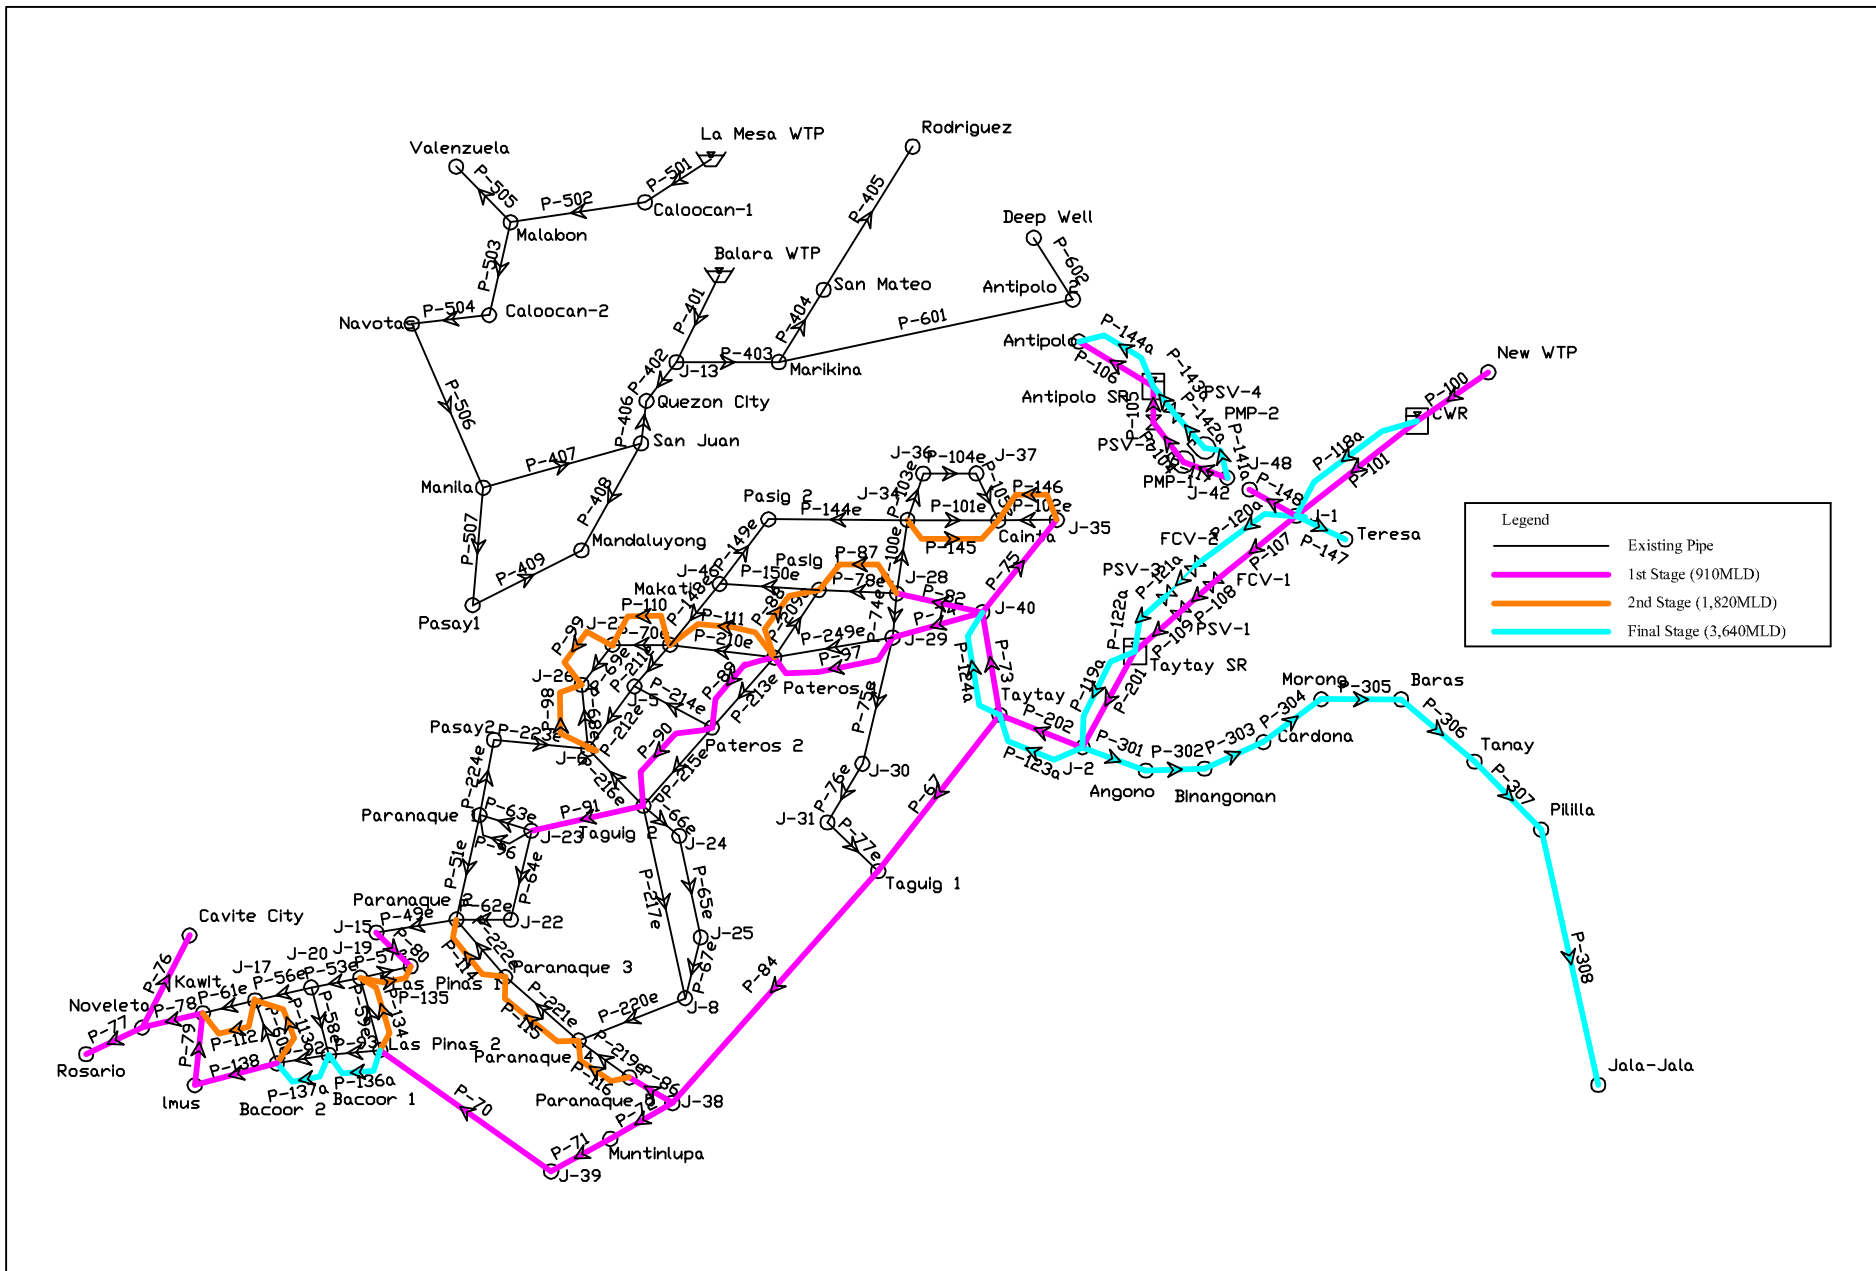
Preliminary Layout Plan of Distribution Trunk Mains
